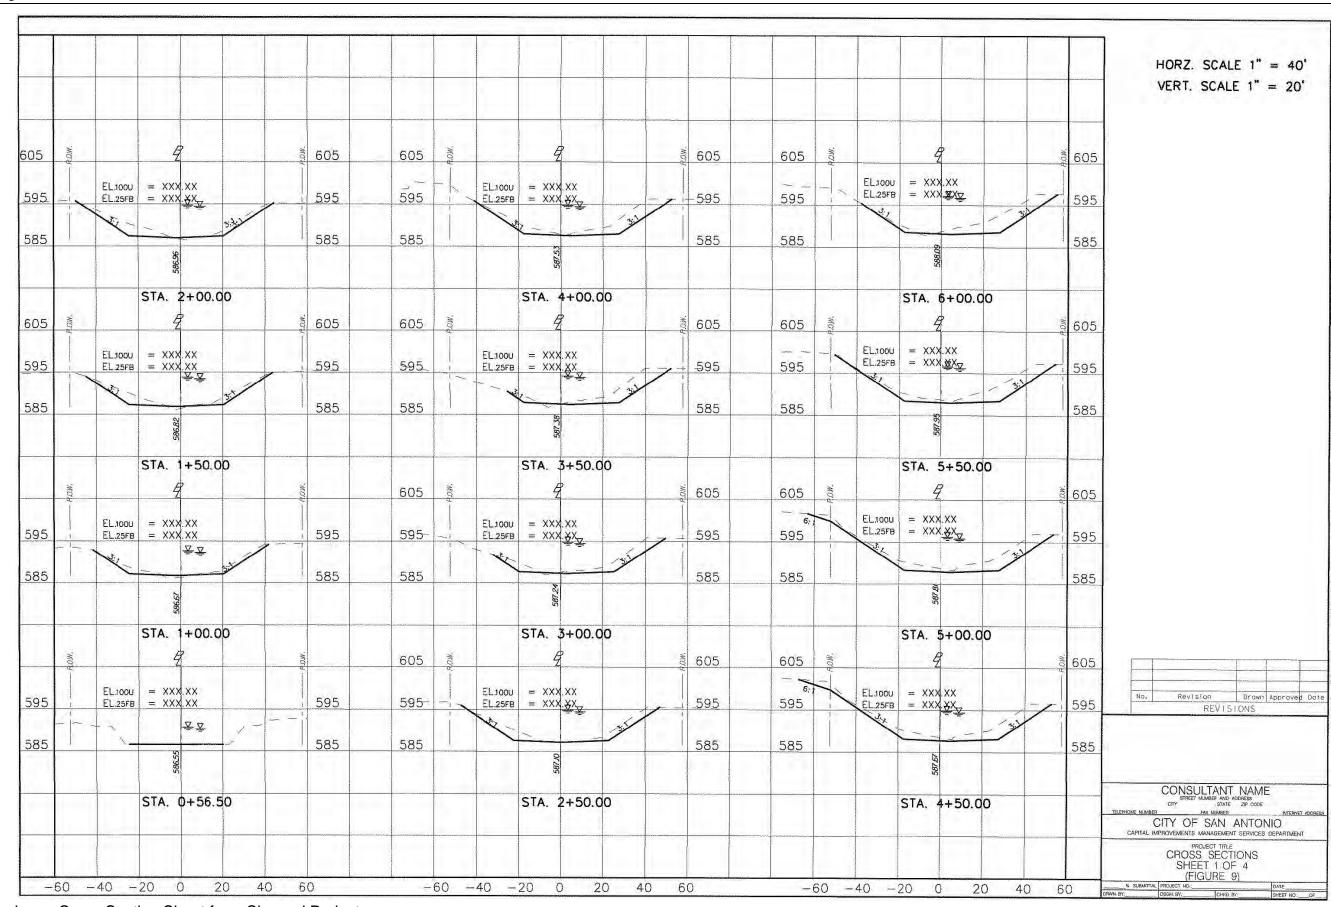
Drainage Cross-Section Sheet for a Channel Project
